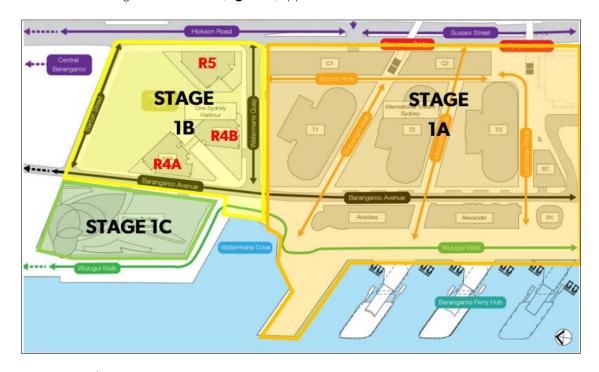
| Stage 1A of Barangaroo South shown by the orange shading (Base source: Applicant)
